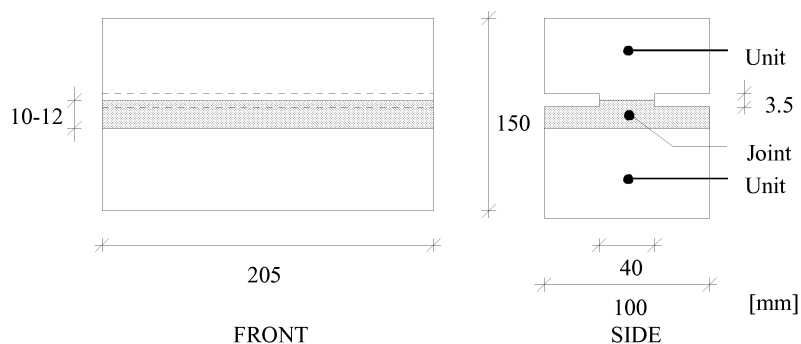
Specimen for shear compressive test of bed joint in LECA masonry
